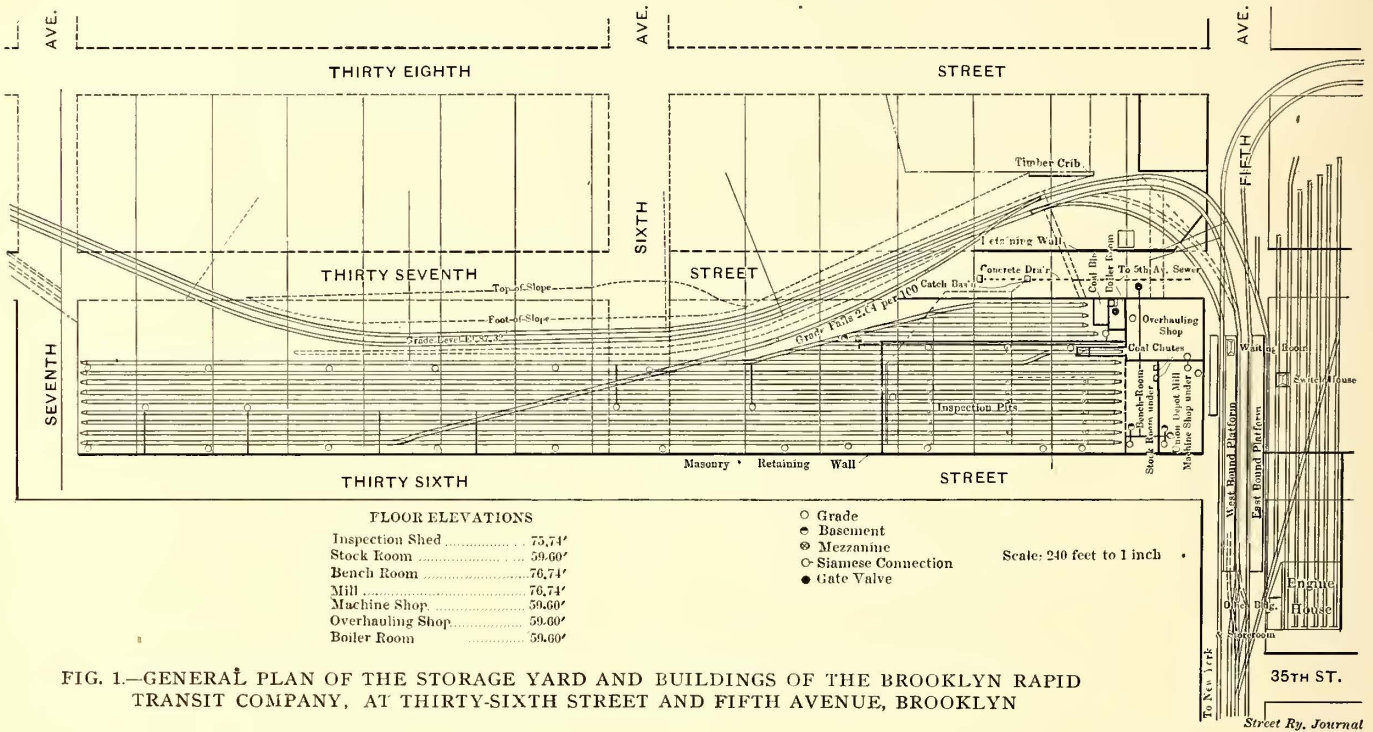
GENERAL PLAN OF THE STORAGE YARD AND BUILDINGS OF THE BROOKLYN RAPID TRANSIT COMPANY, AT THIRTY-SIXTH STREET AND FIFTH AVENUE, BROOKLYN
